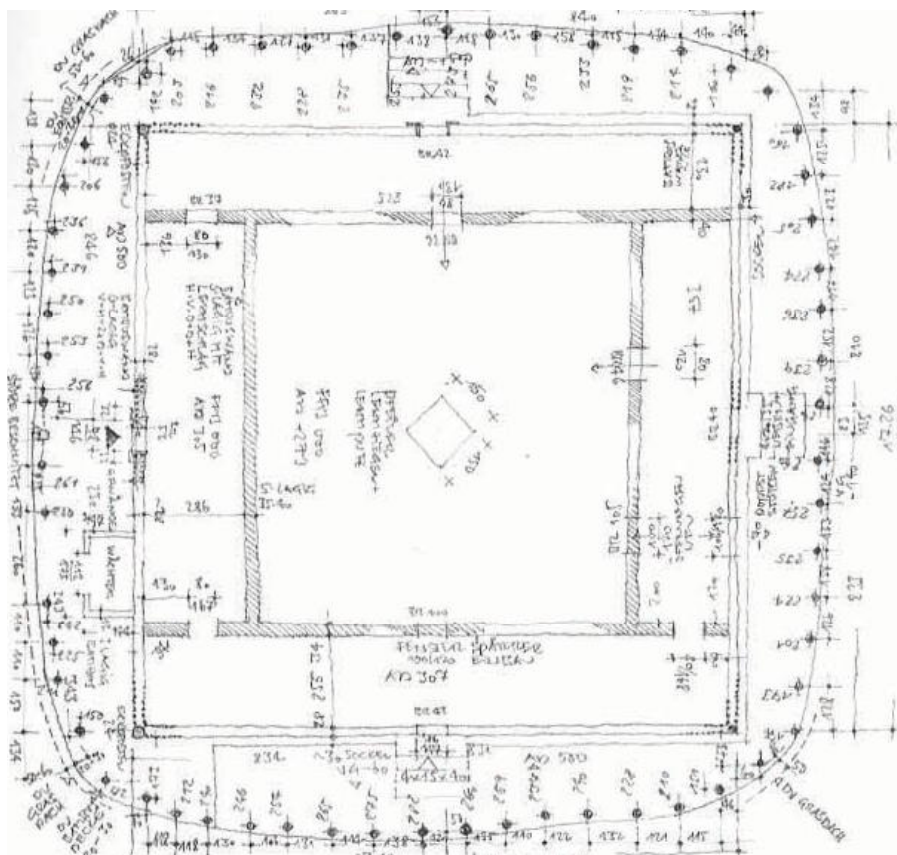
Plan of the Palace of Bandjoun, illustrating the ‘3 skin’ construction (Source-Lauber: 2005, 47)
